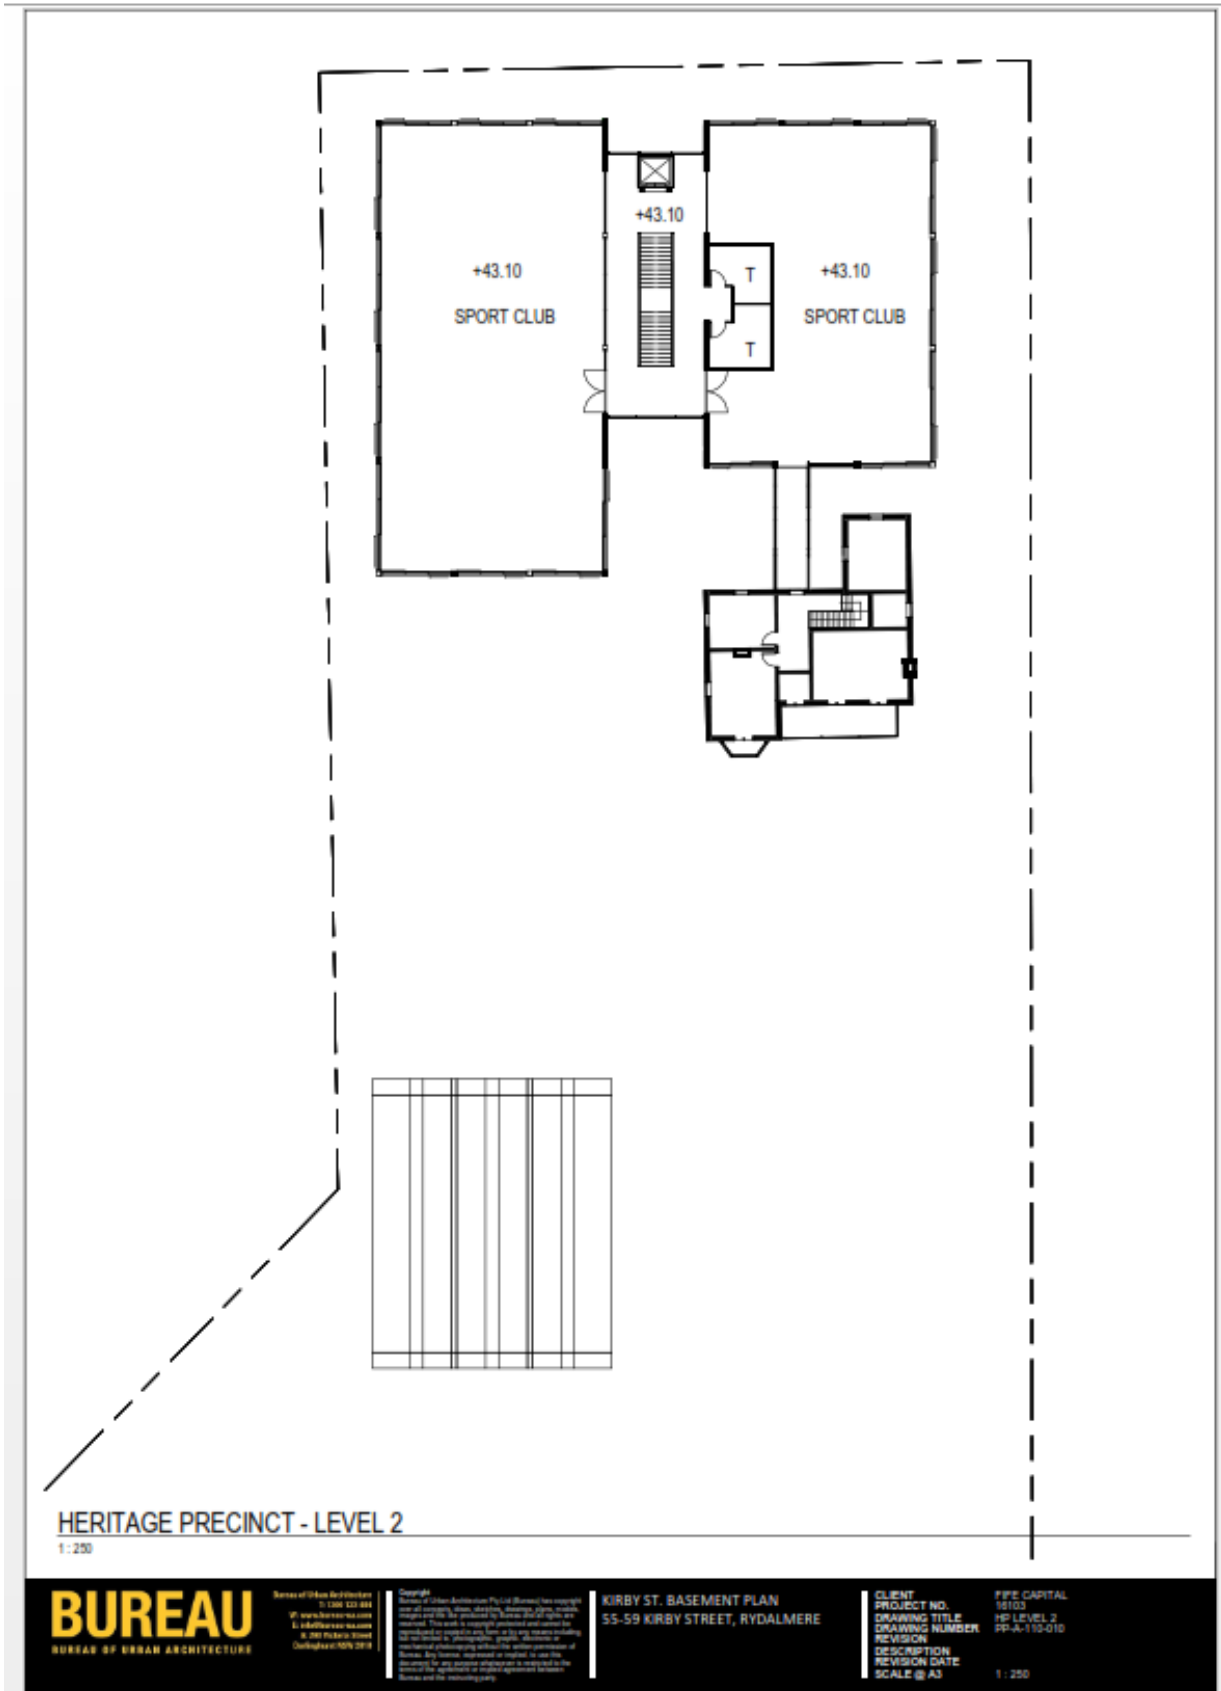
Upjohn House Heritage Precinct – Level 2 Floor Plan
